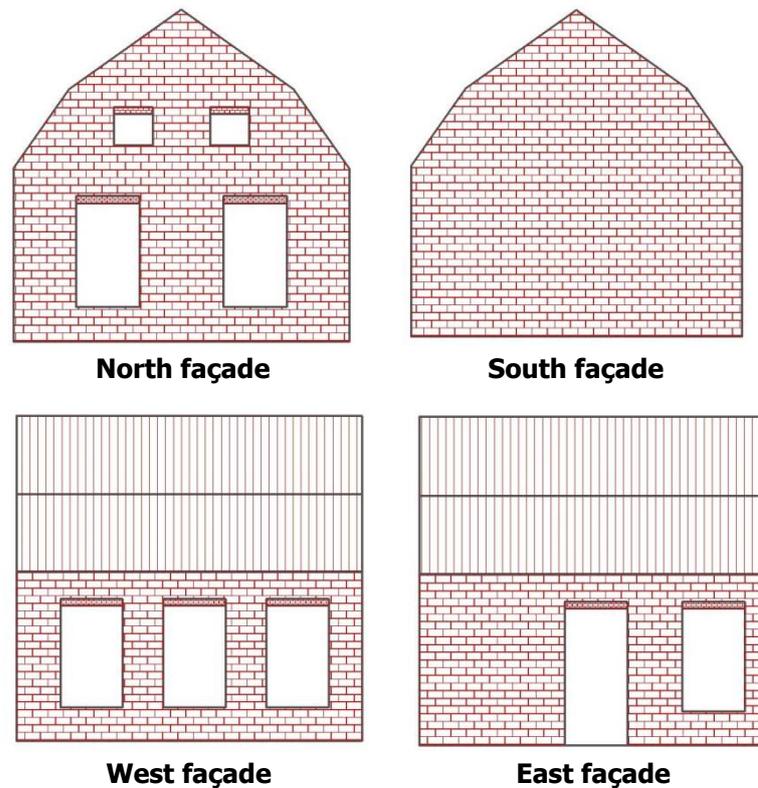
Layout of the façades of reference building LNEC-BUILD-3, as studied in the current work.
